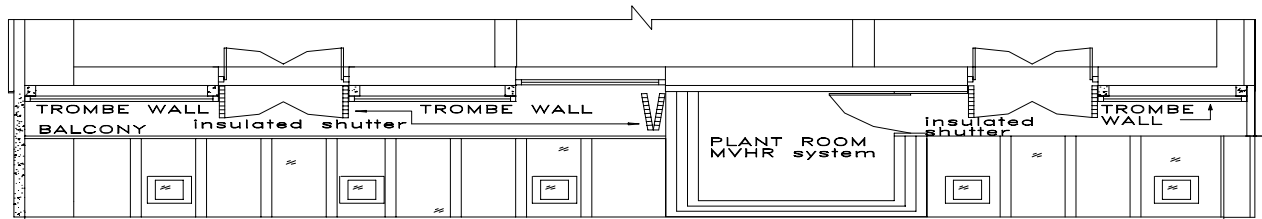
Ventilation Routes In The Ground Floor Rooms For Tas Lite Models A To C And S
